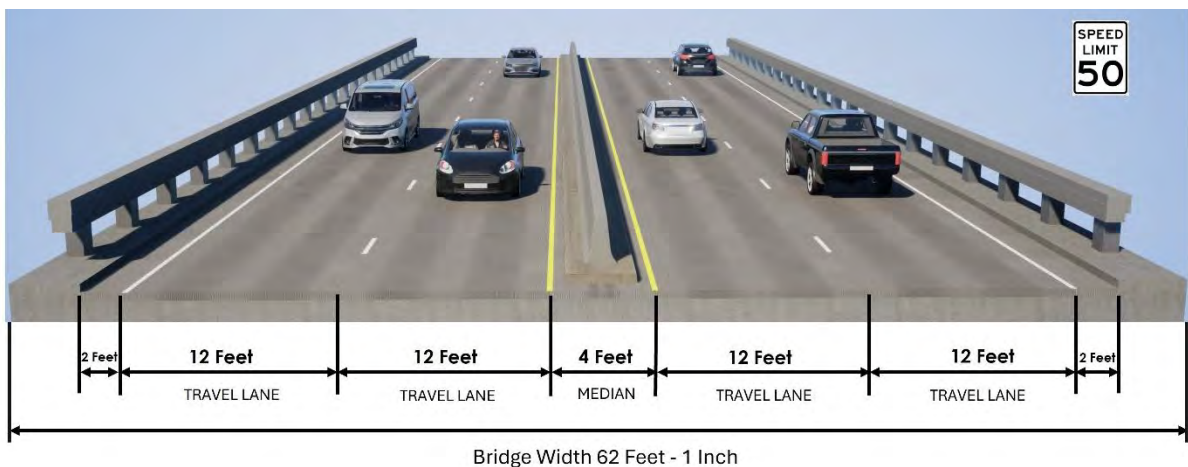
Existing Structure Typical Section: DeSoto Bridge
